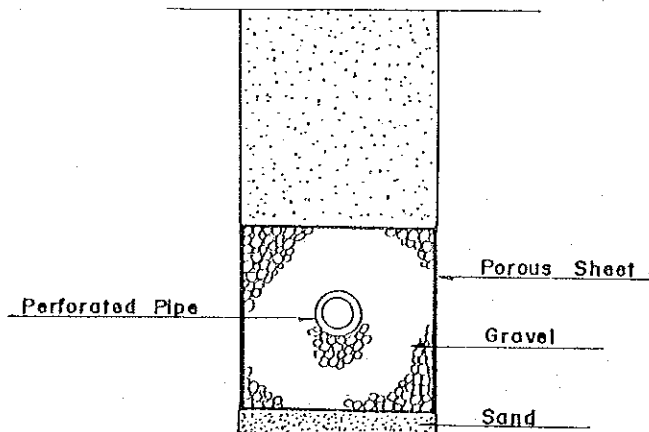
STANDARD DRAWING OF INFILTRATION TRENCH
